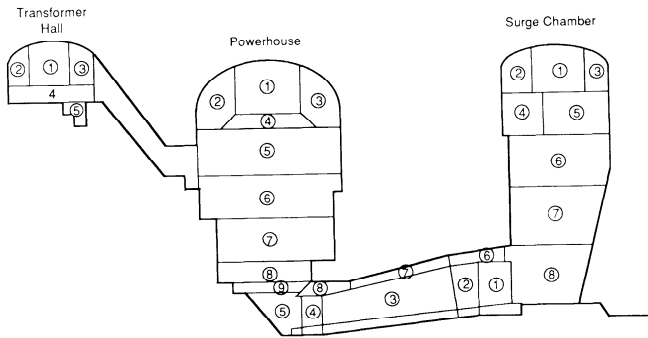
Excavation sequence for Churchill Falls underground powerhouse.
